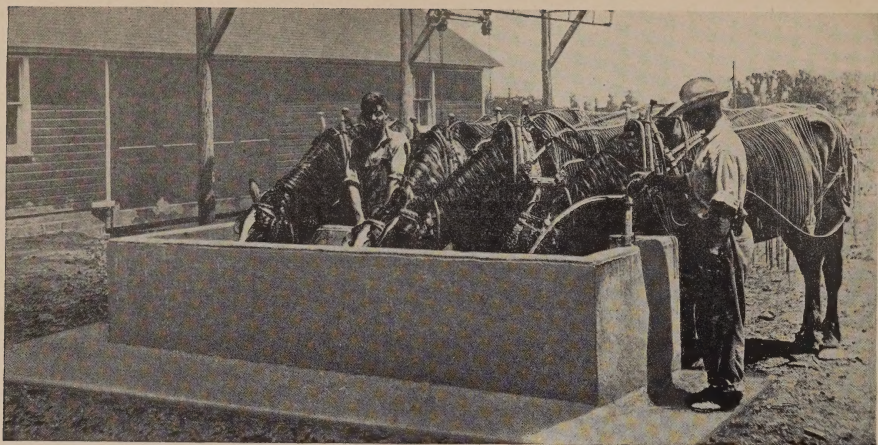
A concrete water trough with concrete pavement around the outside. This pavement prevents the ground from becoming muddy due to splashings from trough.
